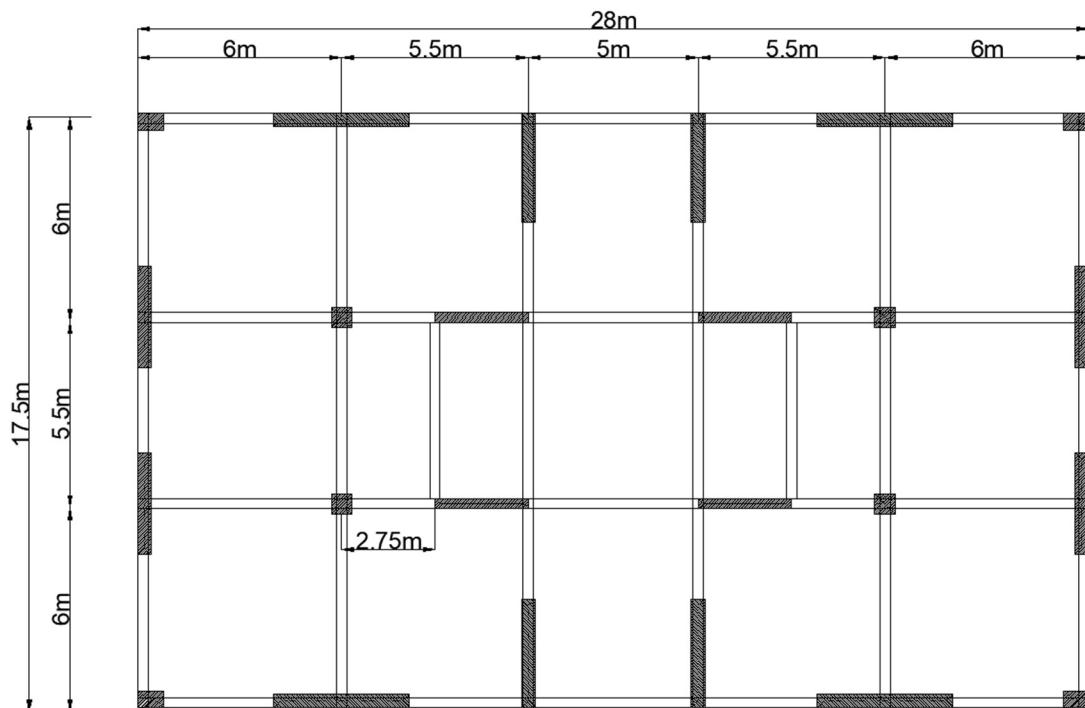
The structural plan of the reinforced concrete system with shear frame
